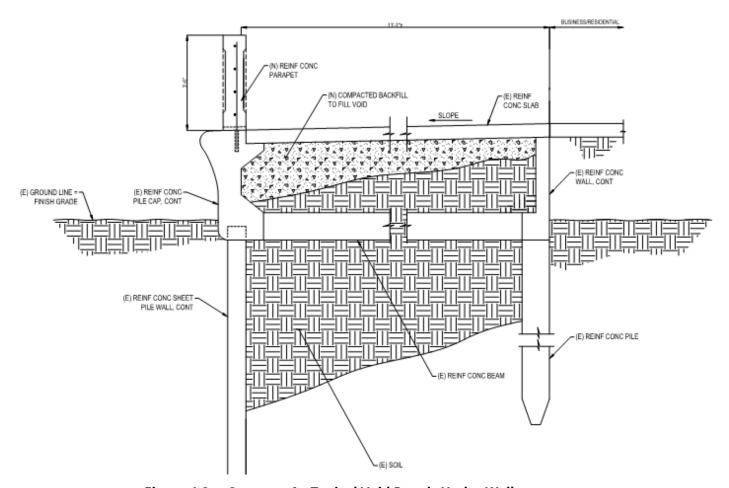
Segment A - Typical Void Repair Under Walkway
